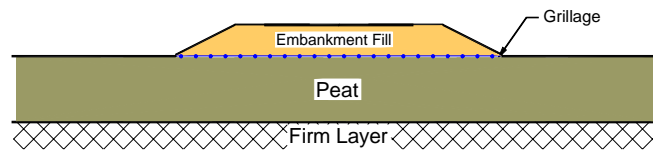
Cross-section showing a timber grillage. (G. Smith).
